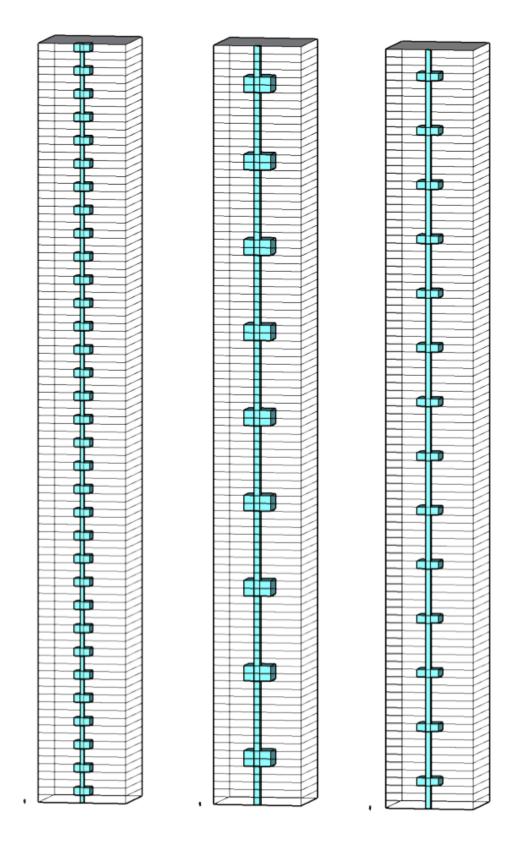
Building 3 with the three ventilation configurations for waterborne cooling at  $30 \text{ W/m}^2$ . Marked in blue is the plant rooms and ventilation ducts. A person is placed at the bottom left of each building for scale.
